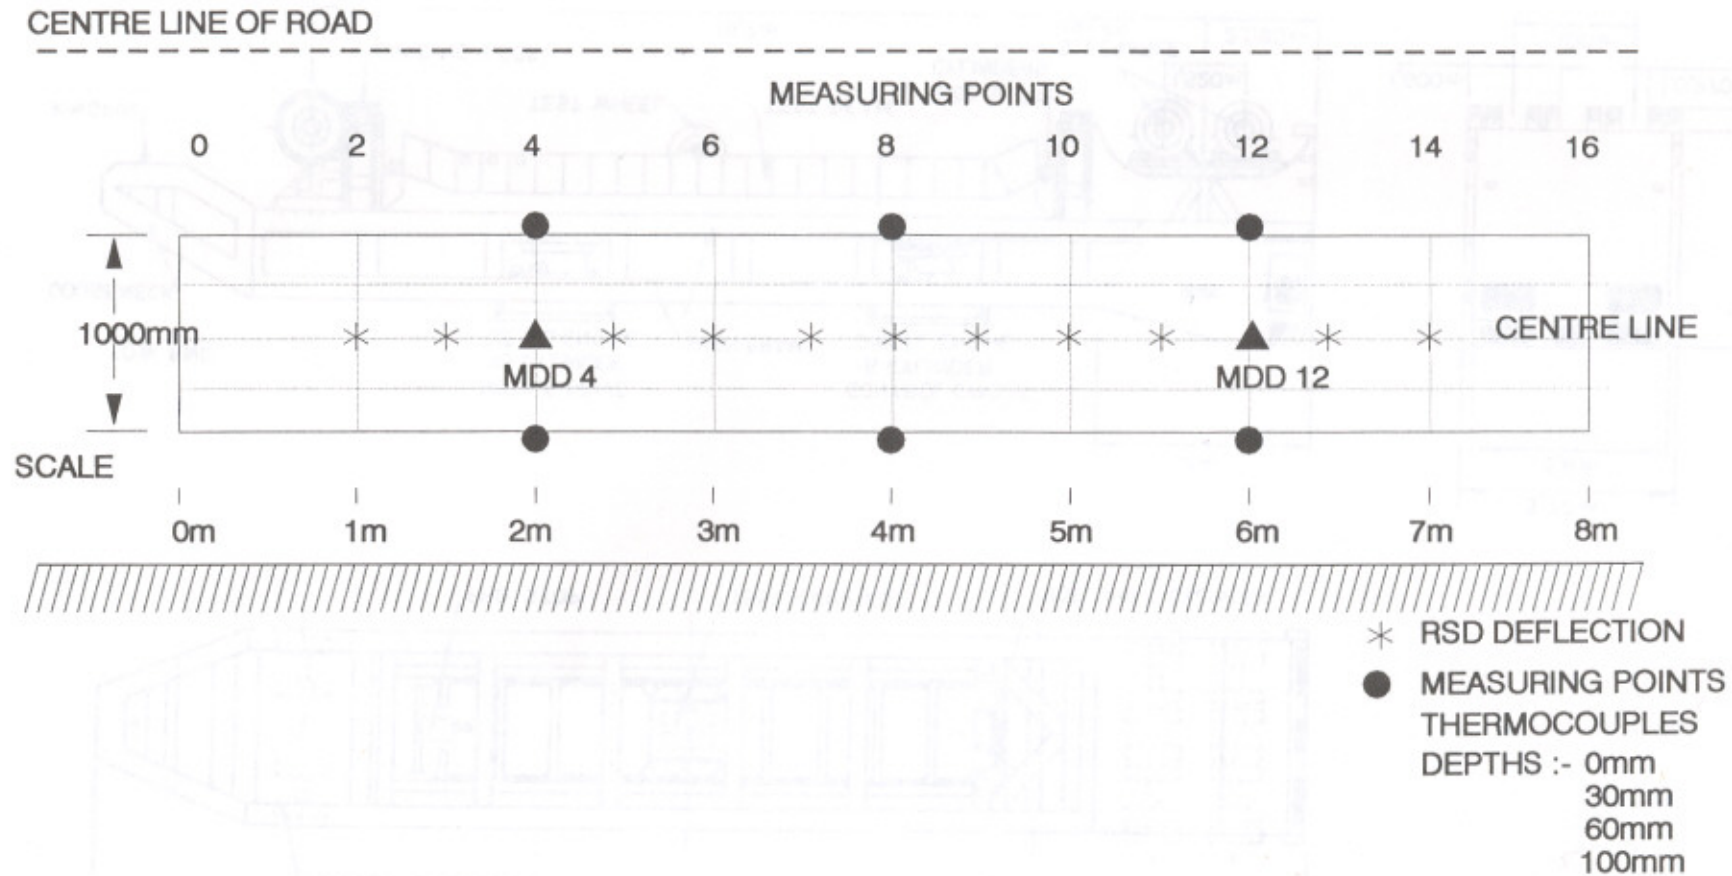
LAYOUT OF A TYPICAL HVS TEST SECTION
